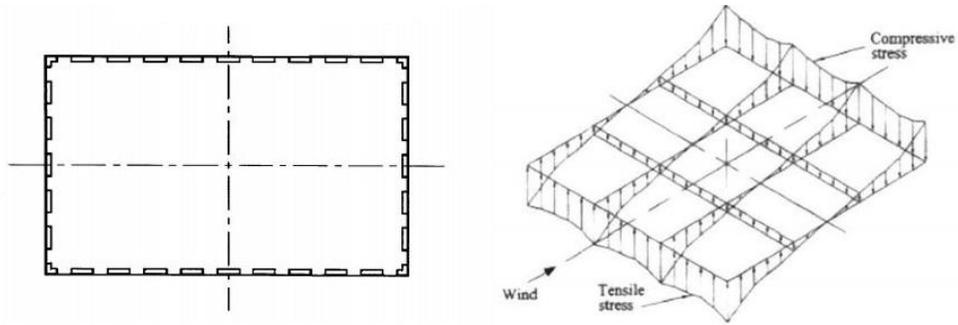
Characteristic Arrangement of the Structural Elements for Framed Tubes in Plan (left) and Diagram of Shear Lag Effect (right) [1]
